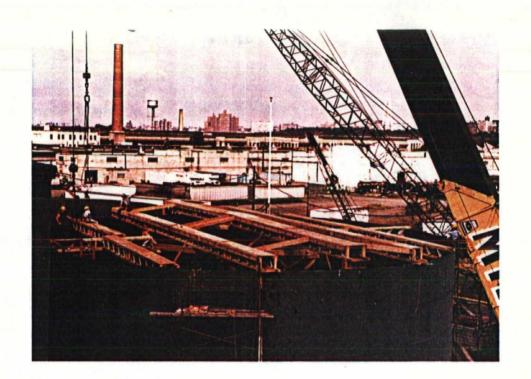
Installing Support Joists, Tank A-7. 8/23/85
